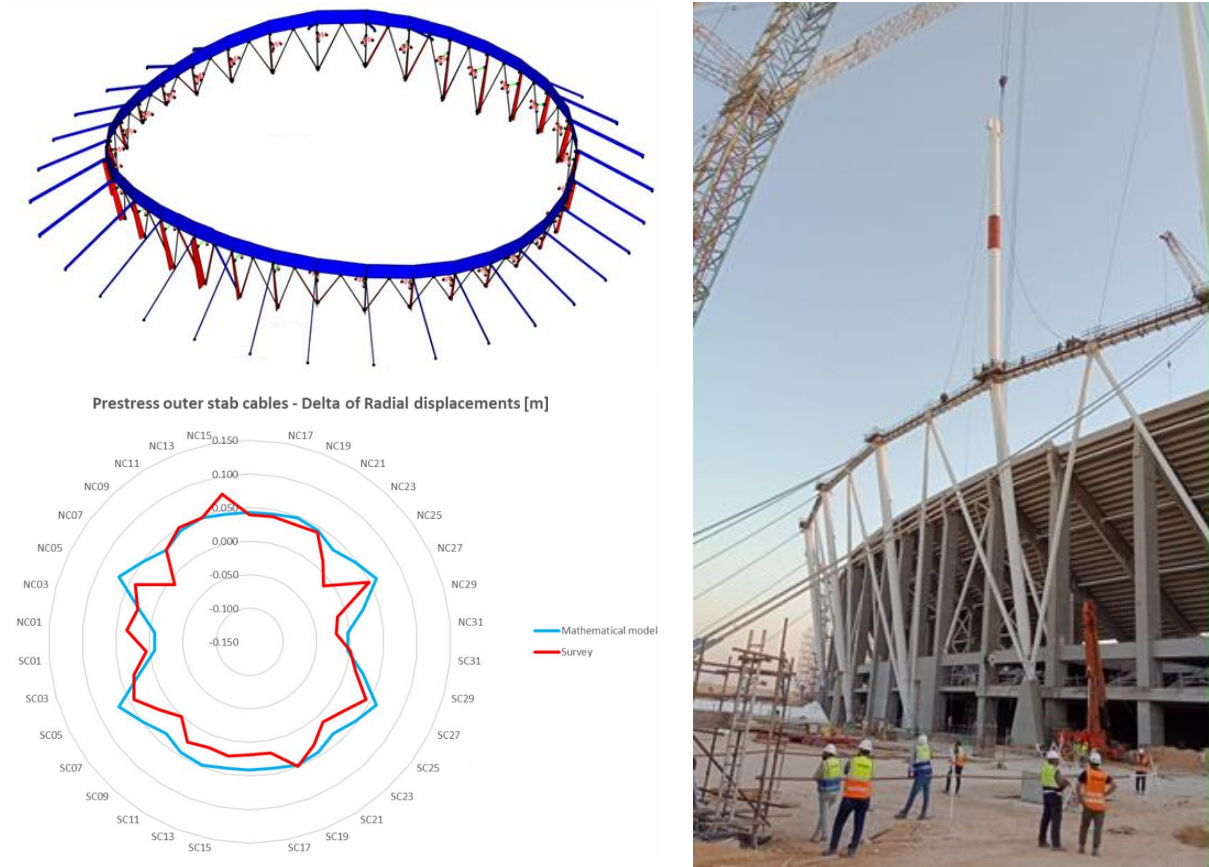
Top pylon installation after an initial prestress of the outer stabilizing cables
